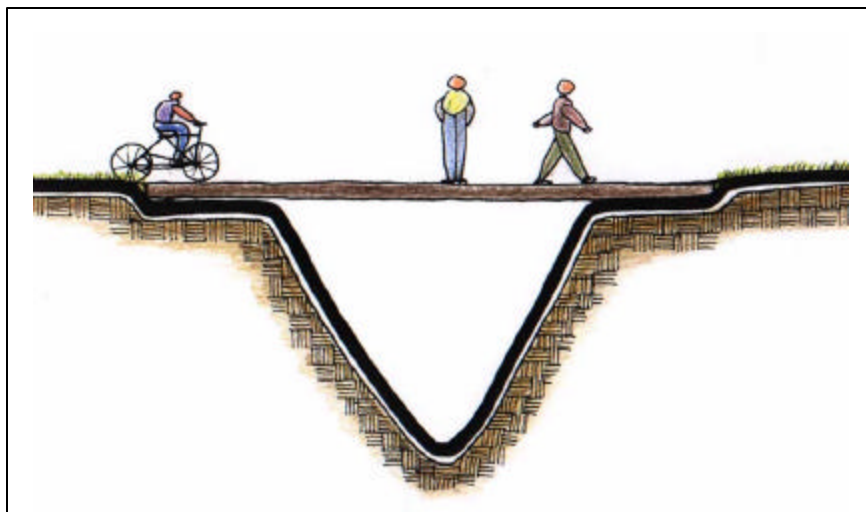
A north-to-south cross section showing a V-shaped opening on the south end of the levee
